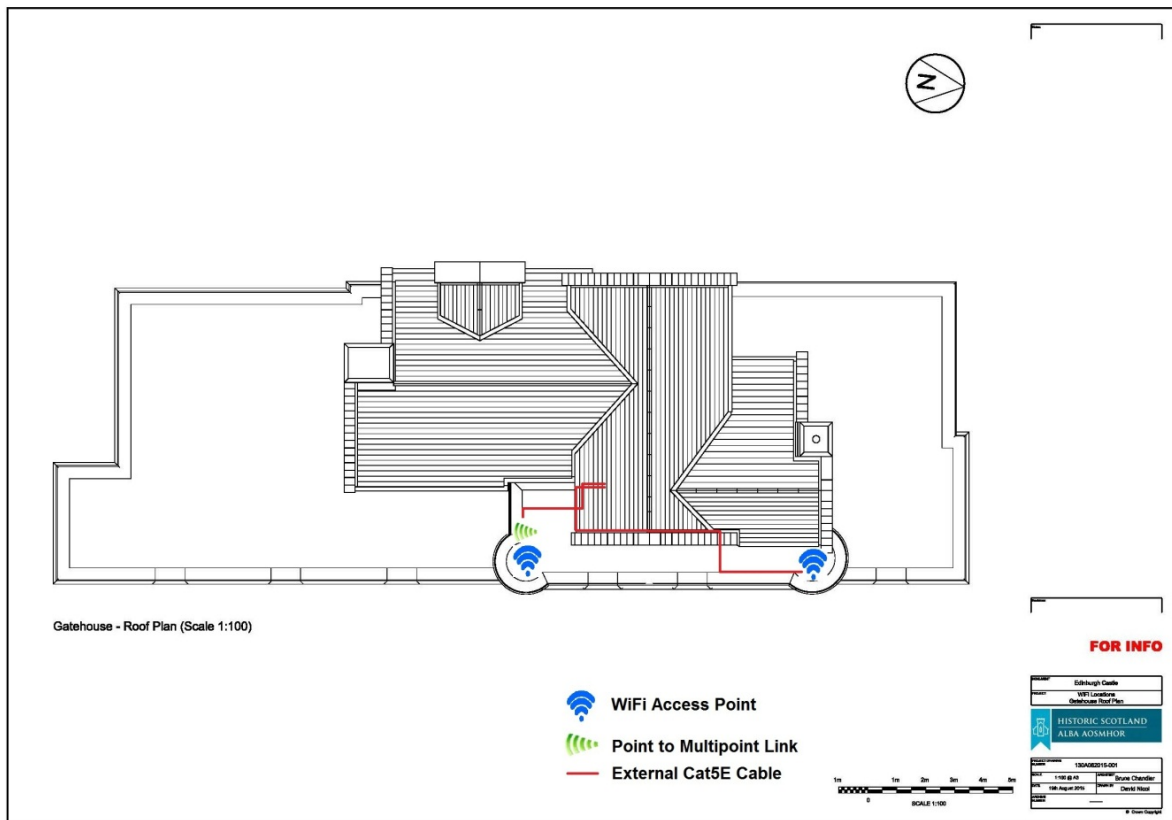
Edinburgh Castle Gatehouse roof equipment location (South)
